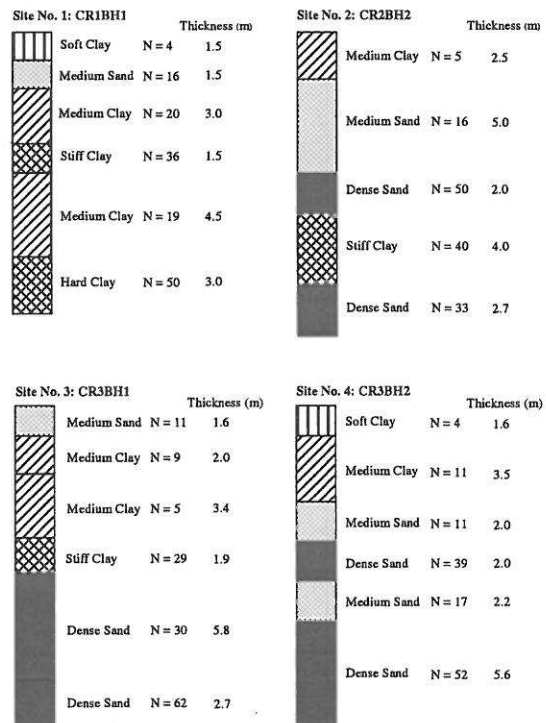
Examples of the soil profiles and soil properties collected from Chiang-Rai
